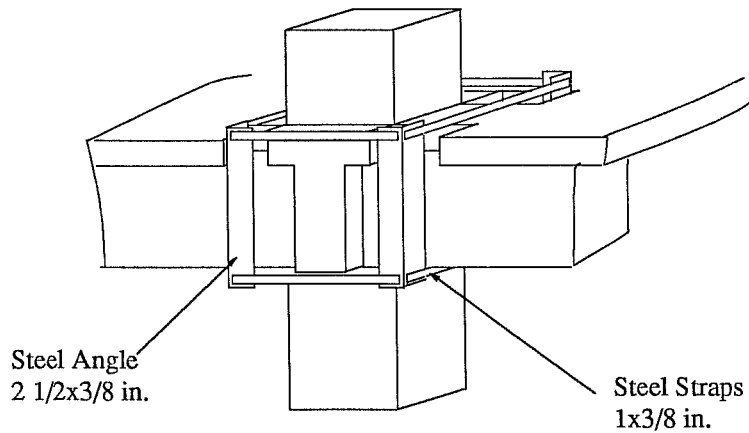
Steel Cage Assembled around Beam-Column Joint (from Ref. 35)
